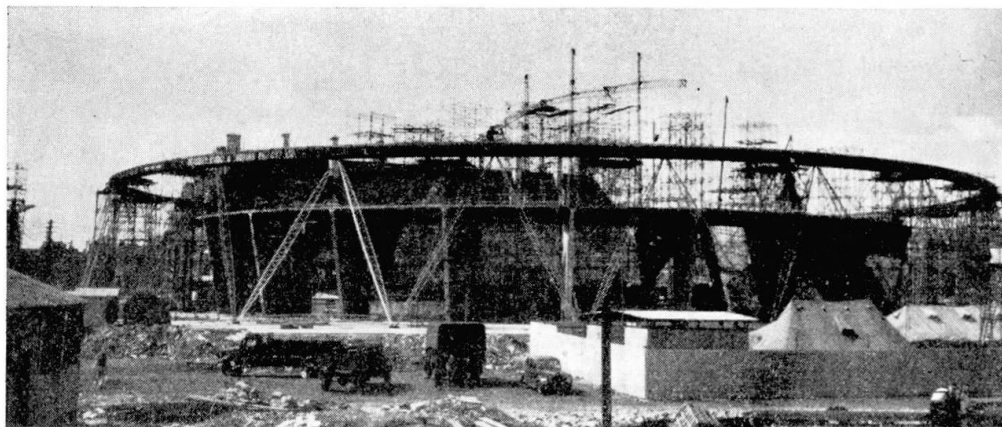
Ring Girder and Struts complete. First arch being erected, 15/6/50
